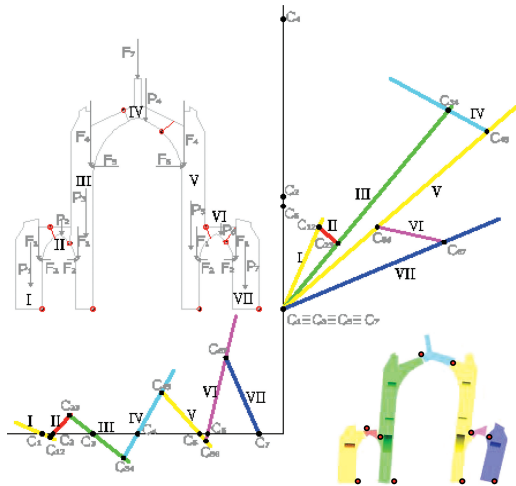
Location of the hinges for the collapse mechanism for the transversal arch (nave arcade).
